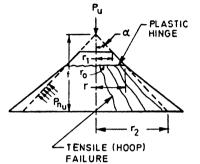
ULTIMATE FAILURE OF CONICAL FOOTING
